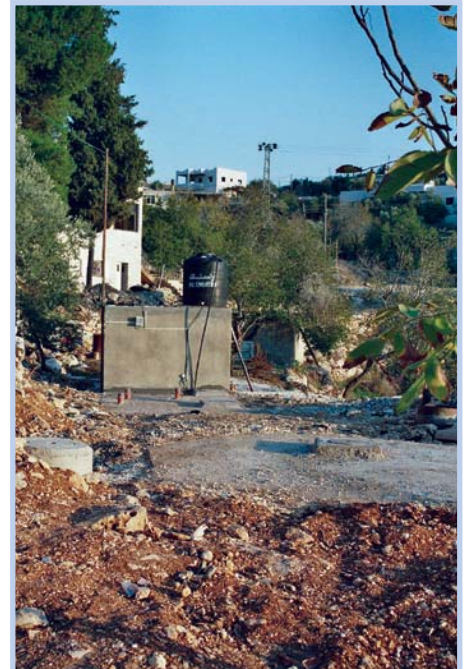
Greywater treatment plant in Al-Zaitunah, Palestine (photo: Sandec)
